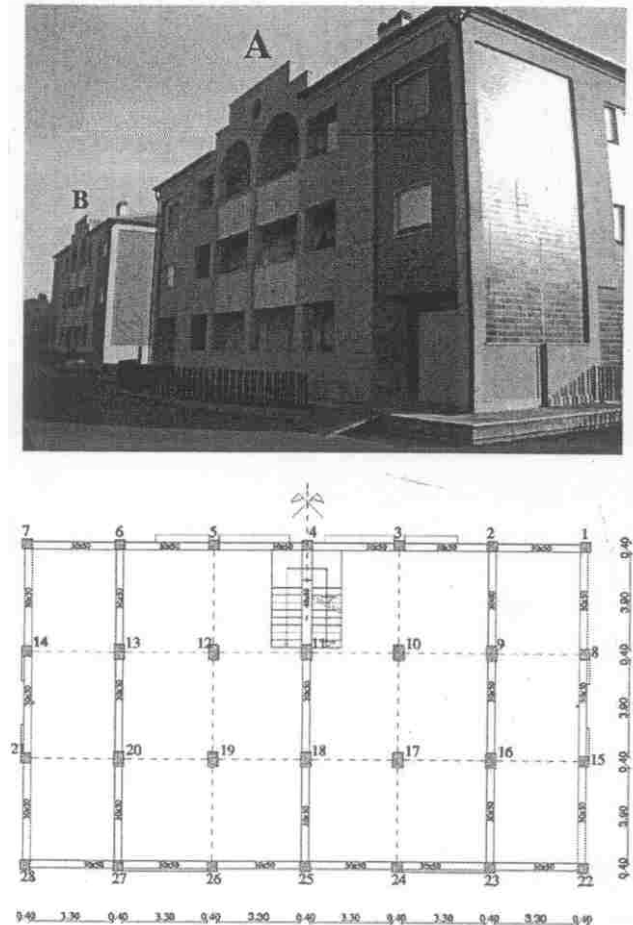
The twin buildings (fix base ‘B’ and base-isolated ‘A’) and layout of typical floor.
